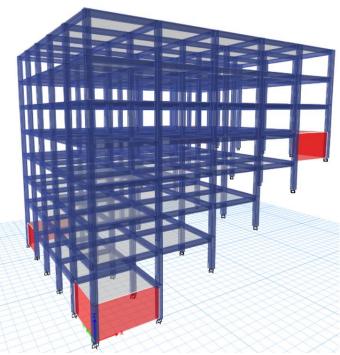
Extruded view of stepback building with shear wall at corner panels
